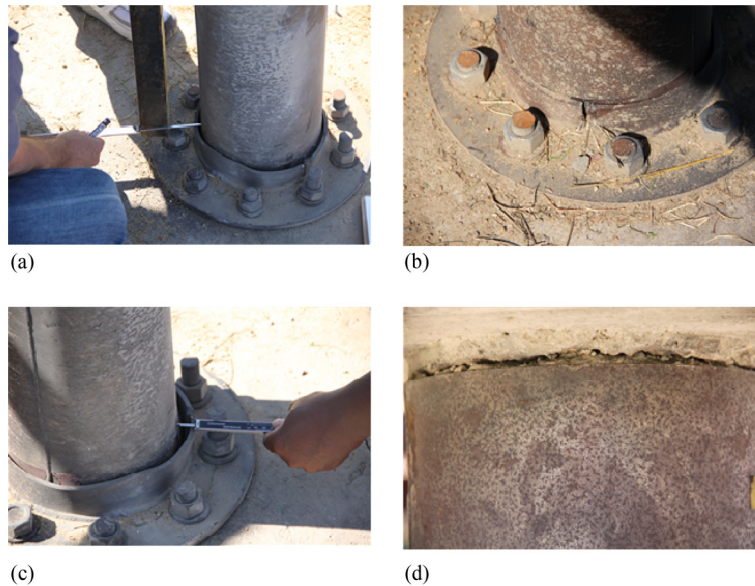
Specimen MSJC1 after second test: (a) inward deformation of collar on side facing charge; (b) crack in collar at weld connection; (c) collar deformations measured using the depth probe of a vernier caliper; (d) widening of preexisting crack at top of specimen
